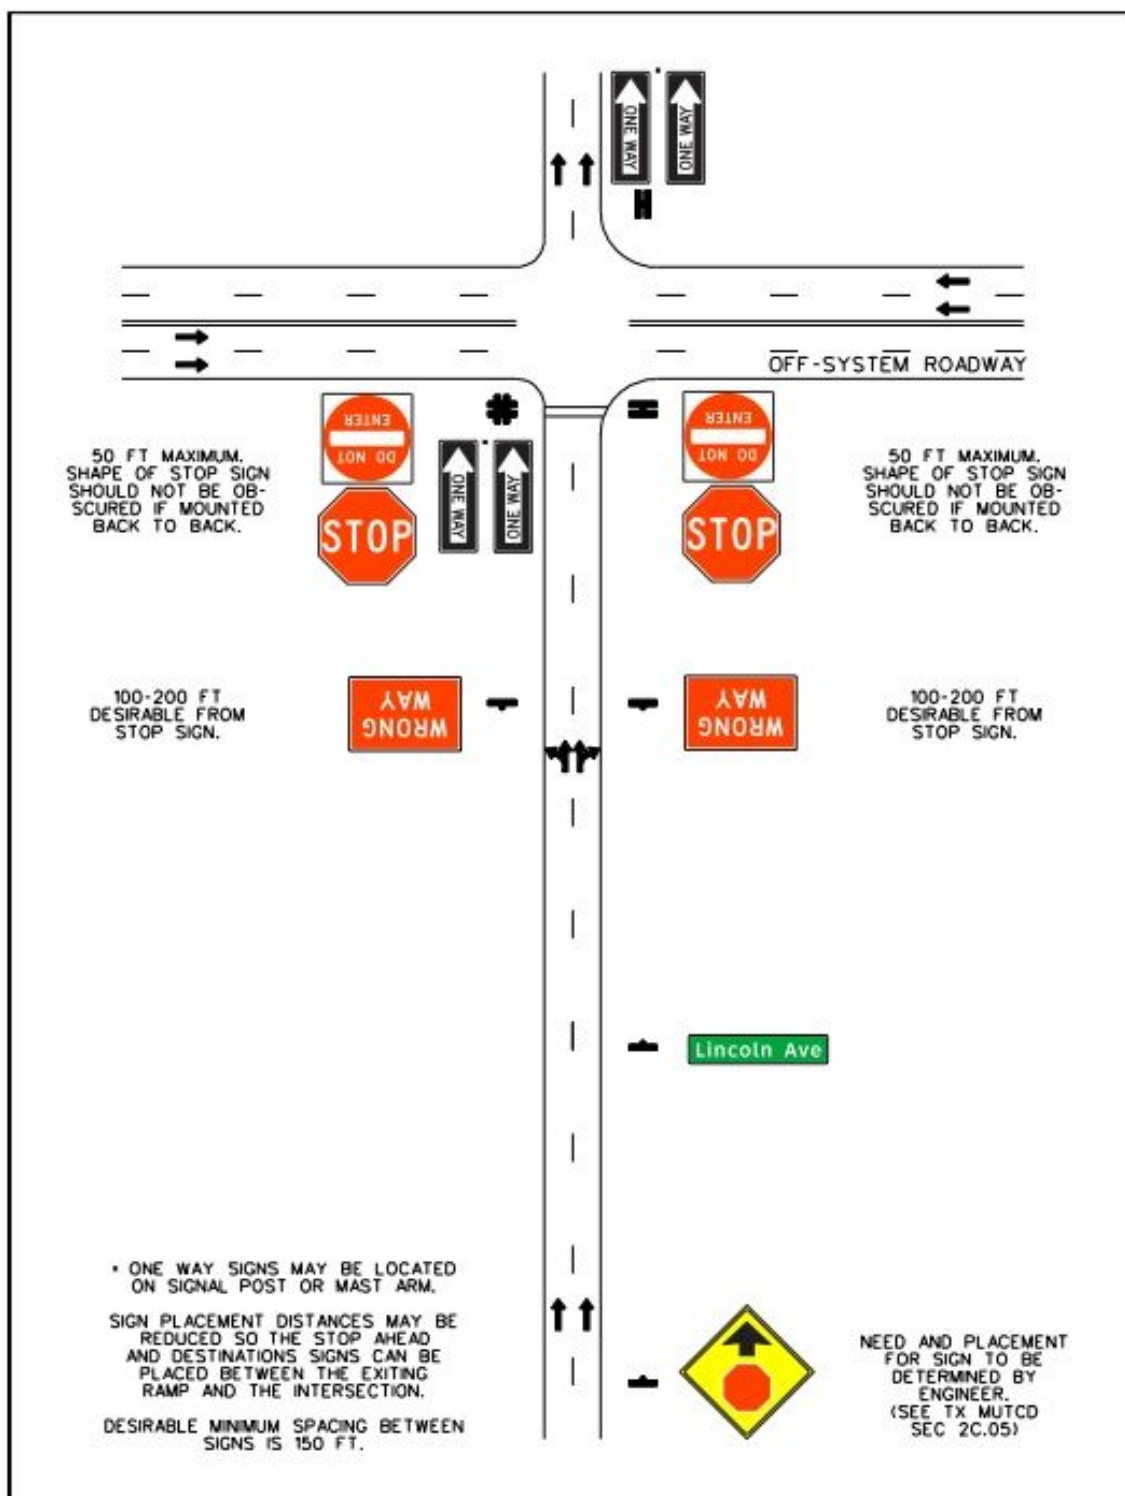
Frontage road approach signing for a two-lane approach to an off-system roadway – stop control.
